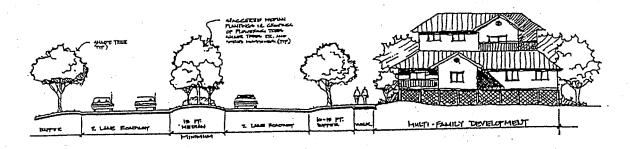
TOWN CENTER STREETSCAPE (Illustrative Sketch Section)
